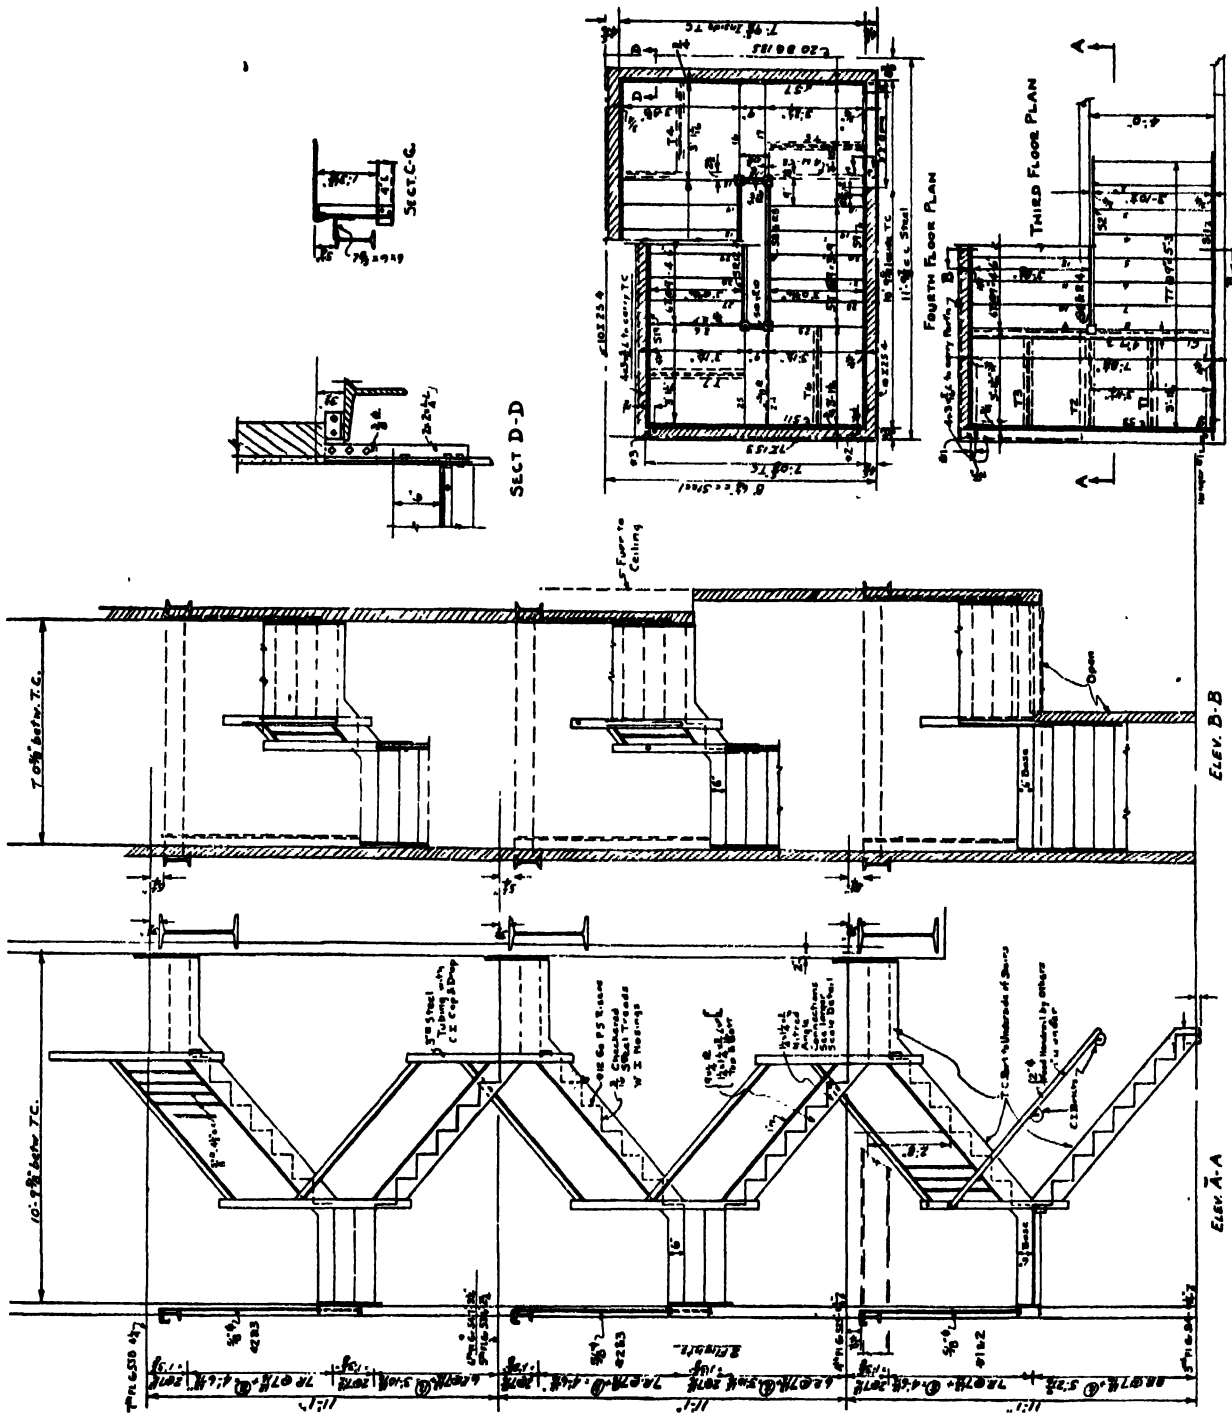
TYPICAL SHOP ASSEMBLY DRAWING
